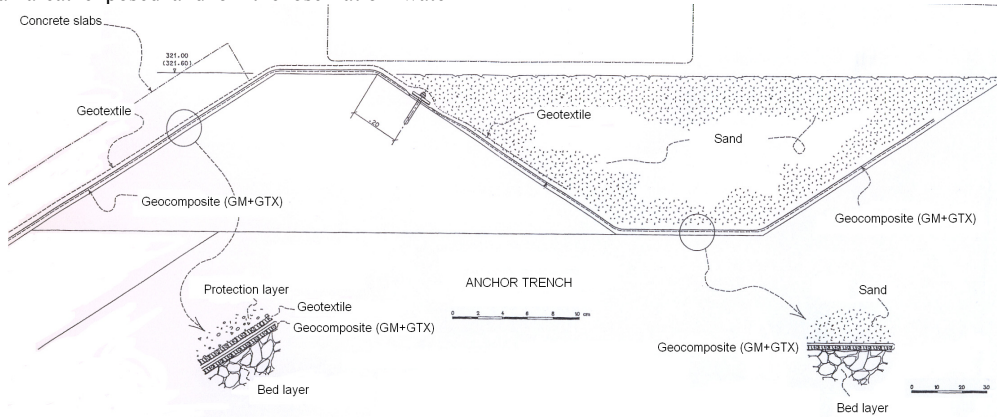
Crest anchorage detail of Bovilla Dam (courtesy by Sembenelli, 1995)
